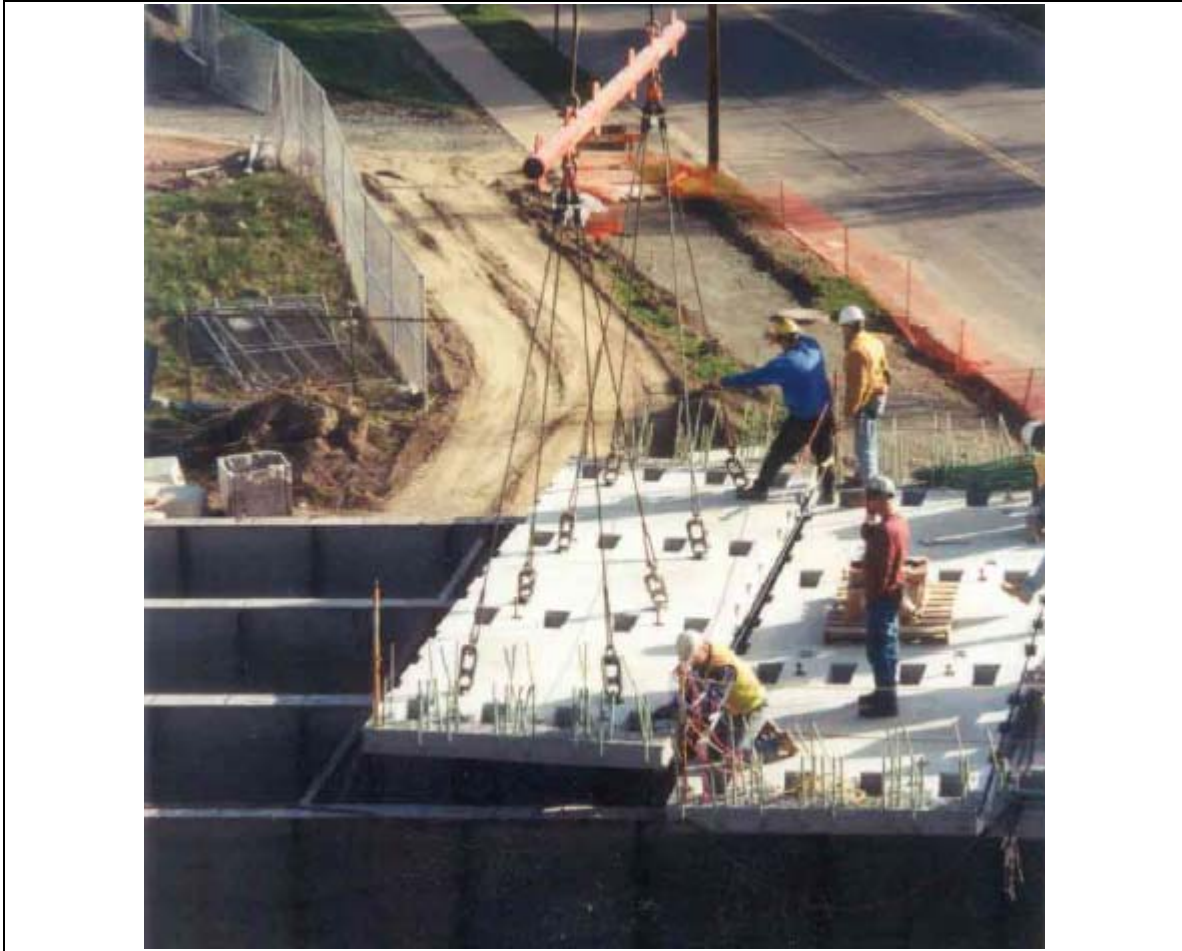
Deck replacement using full-depth precast, prestressed panels in a bridge in West Hartford, CT (CT-DOT, 2000)
